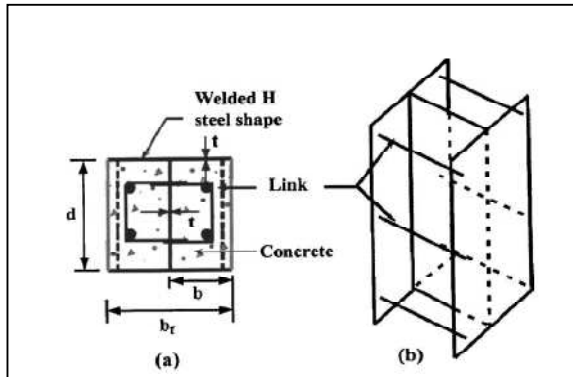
Partially Encased Composite Column with Thin-Walled Built-Up Steel Section, (a) Column Cross-Section and (b) 3D view of the Steel Configuration
